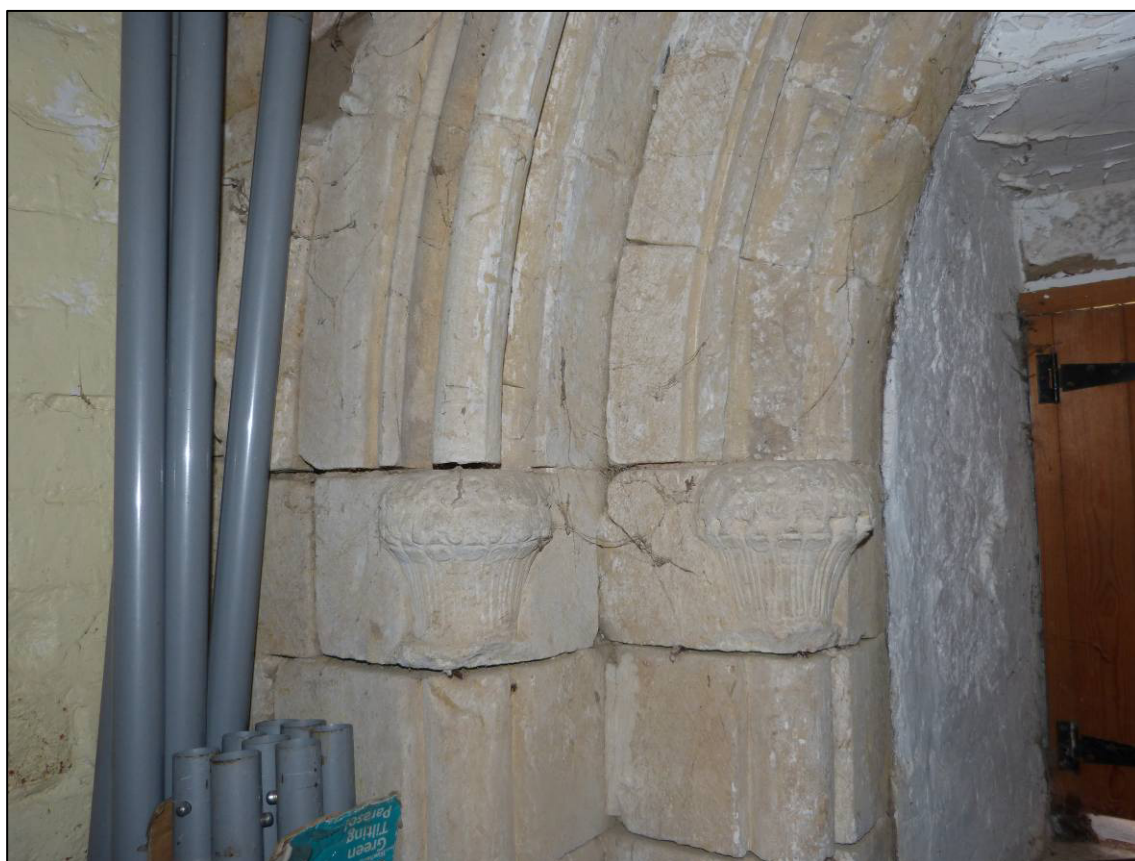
West side of medieval doorway in north wall of house's service range (internal view), looking NW (photo 1/289).
